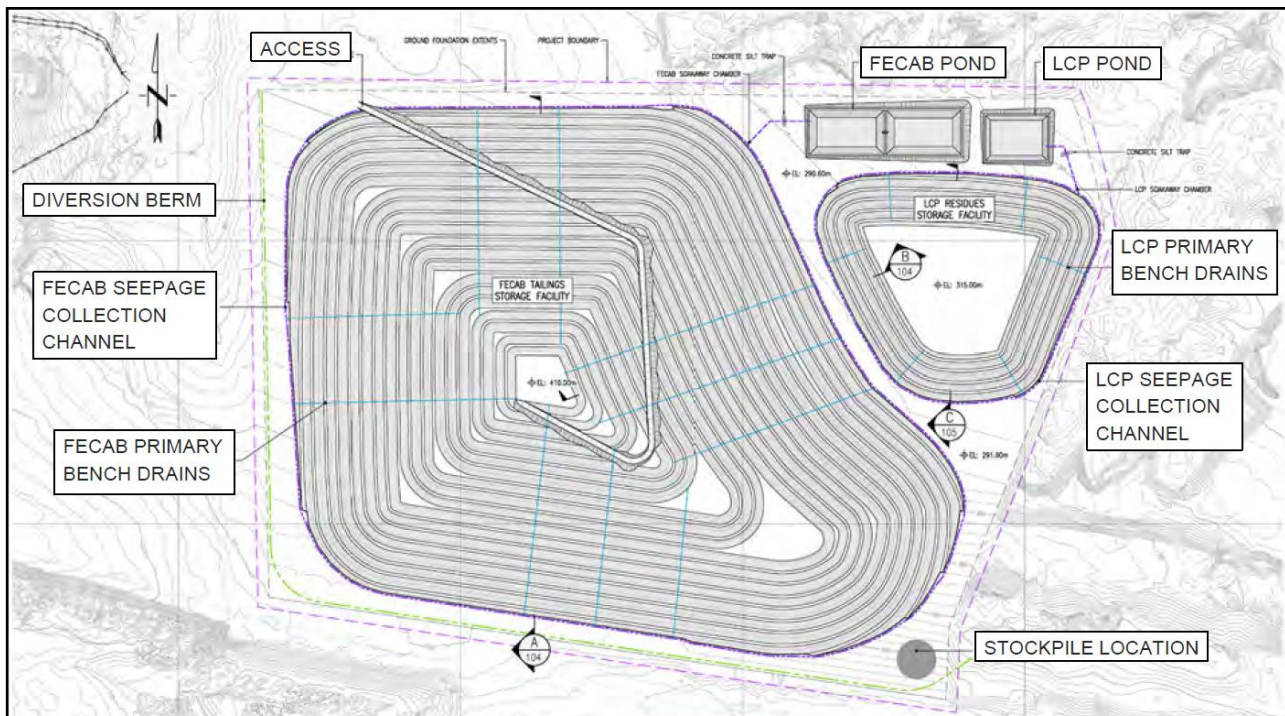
FECAB TSF and LCP TSF – Final Configuration Layout at DNT
